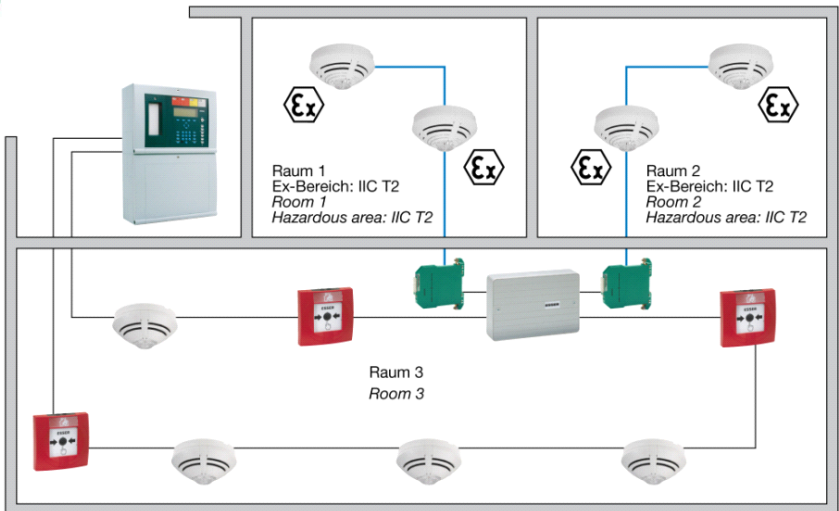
Principal wiring of conventional zones with Ex barrier (Part No. 764744)
